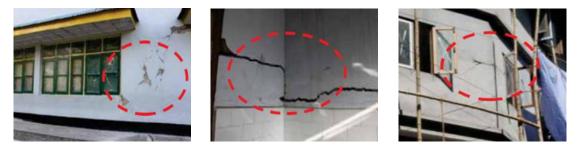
Damages in Unreinforced Masonry infill's
